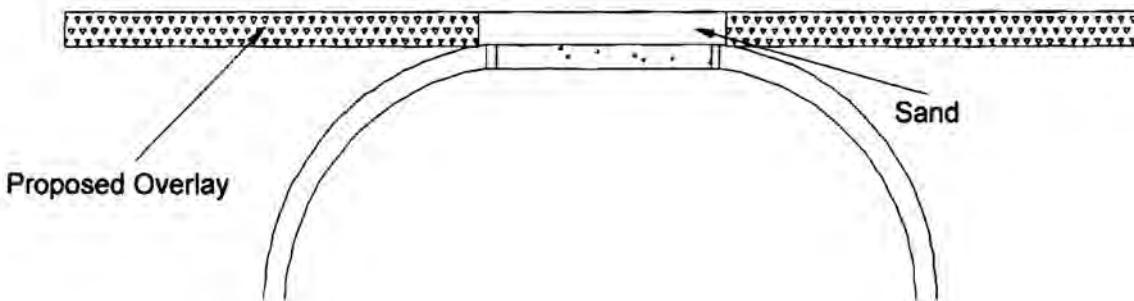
Sand Filling Over Existing Manhole before Providing Overlay
